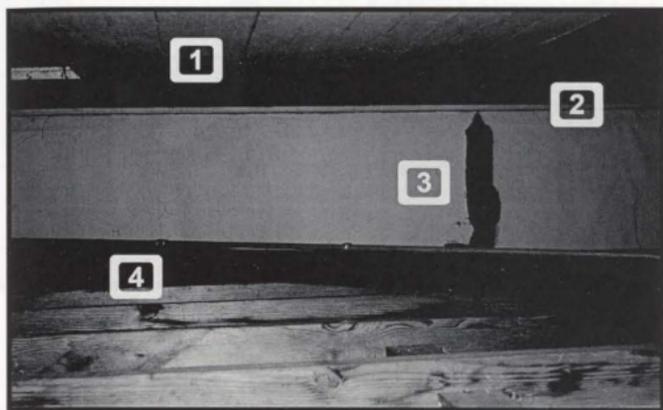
Original ceiling and wall finishes for the Lower Hall, first floor of Temple. (1) Historic Ceiling. (2) Wall trim. (3) Calcimining (historic wall finish). (4) Joists which support current Lower Hall ceiling.
